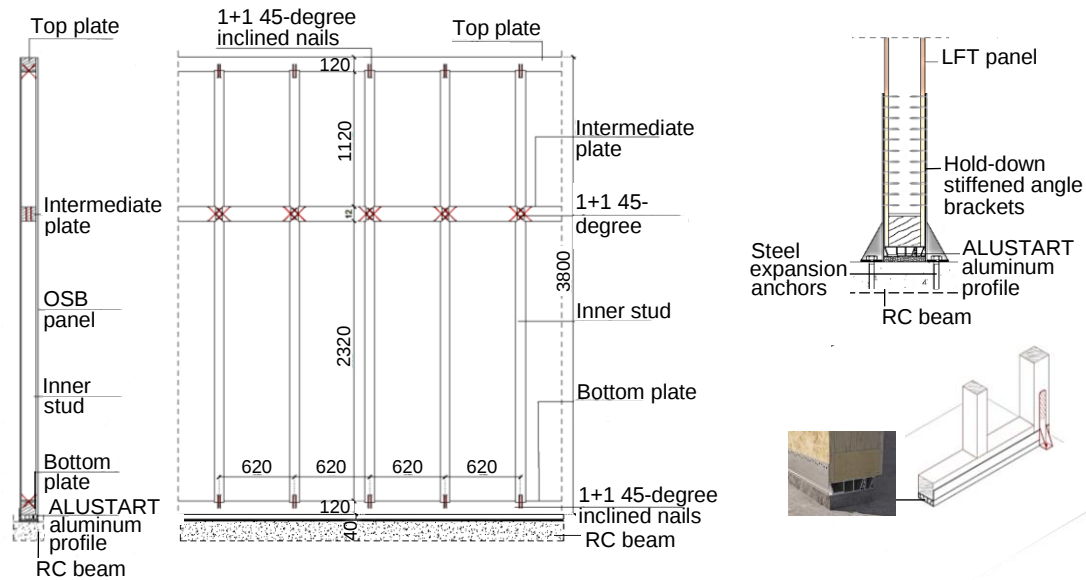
Details of a LFT panel and the connections to the underlying RC beam (dimensions in millimeters)
